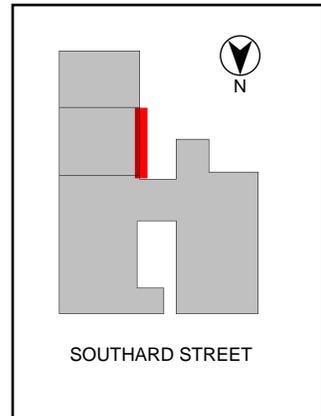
EAST WING, WEST SIDE, EXISTING ADDITION
